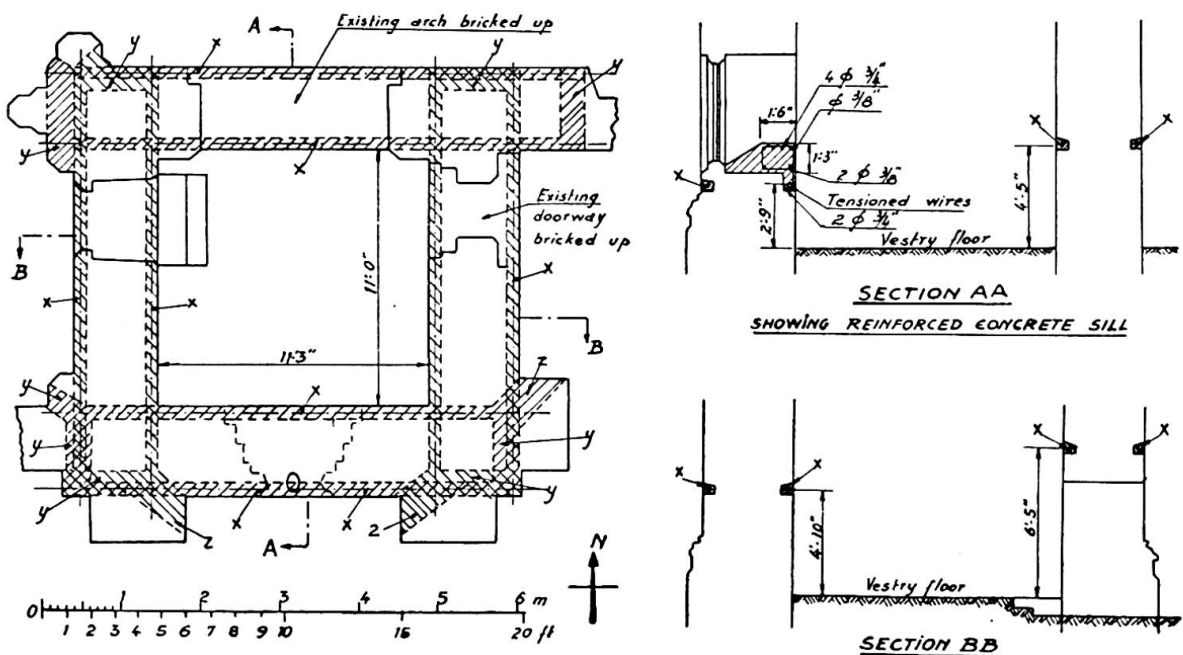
Plan and vertical section of the church tower to be strengthened.
